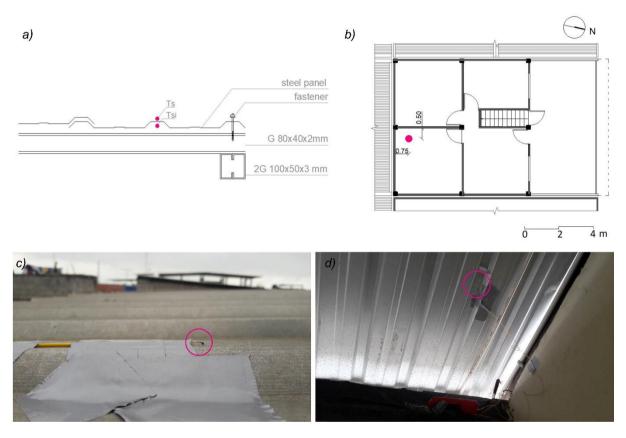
Light metal roof constructive detail (a), floor plan with the thermocouple position (b), outside (c) and inside (d) surface temperature measurements.
